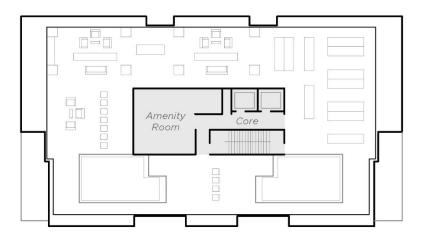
Illustration of rooftop amenity space for mixed-use residential building and apartment
